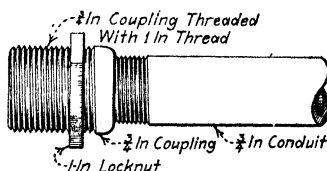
Method of fastening a $\frac{3}{4}$ -in. conduit in a 1-in. knockout hole.
